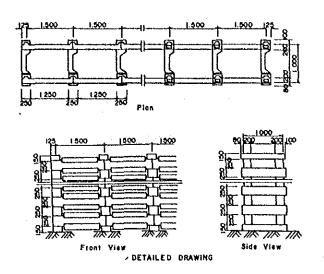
(5) Grid Type Concrete Retaining Wall (Type 6)
